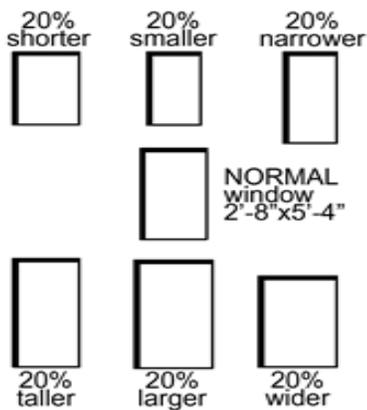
Fenestration Proportions: Minimum differences to achieve subsection (B)
